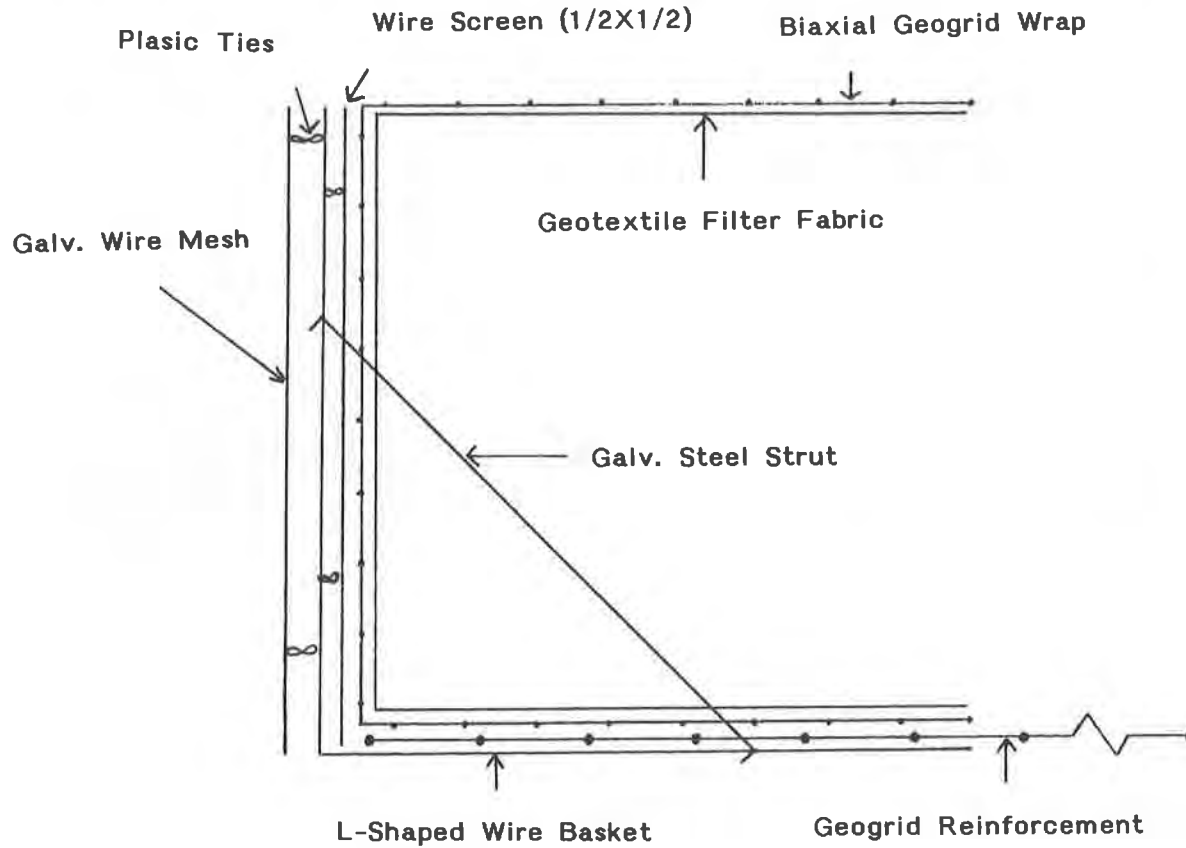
Detail of MSE Structure Facing Prior to Shotcrete Application
